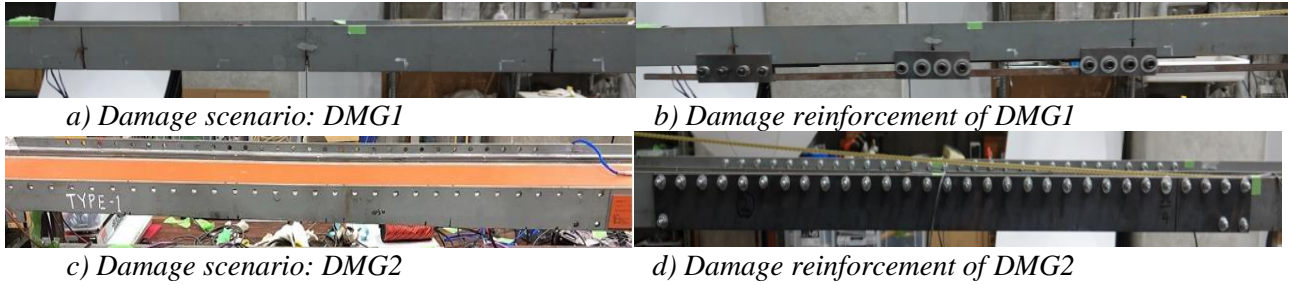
Artificial damages and healthy states subject to damage reinforcement.
